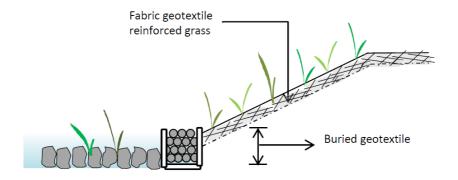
GEOTEXTILE REINFORCED GRASS EMBANKMENT
